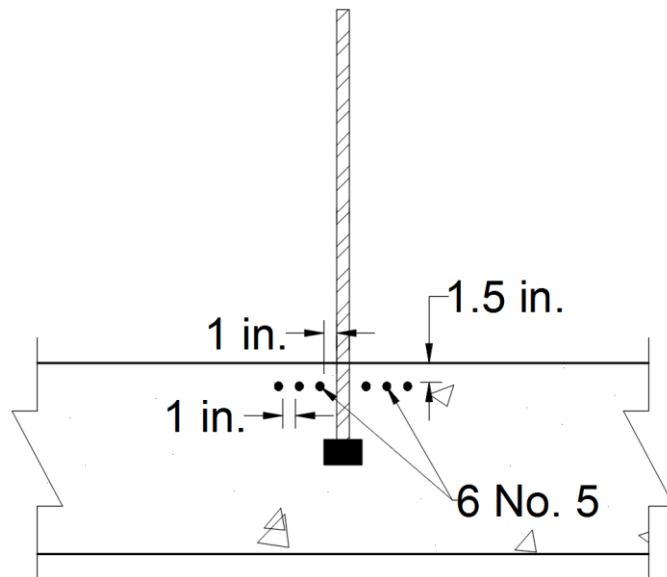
Cross-section view of shallow embedment specimen with 6 No. 5 bars as flexural reinforcement.
